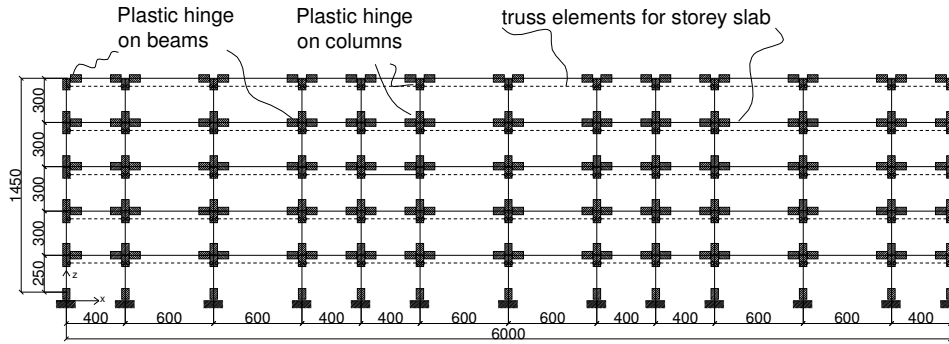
Simplified scheme of non linear model with beam with hinges elements (residential building).
